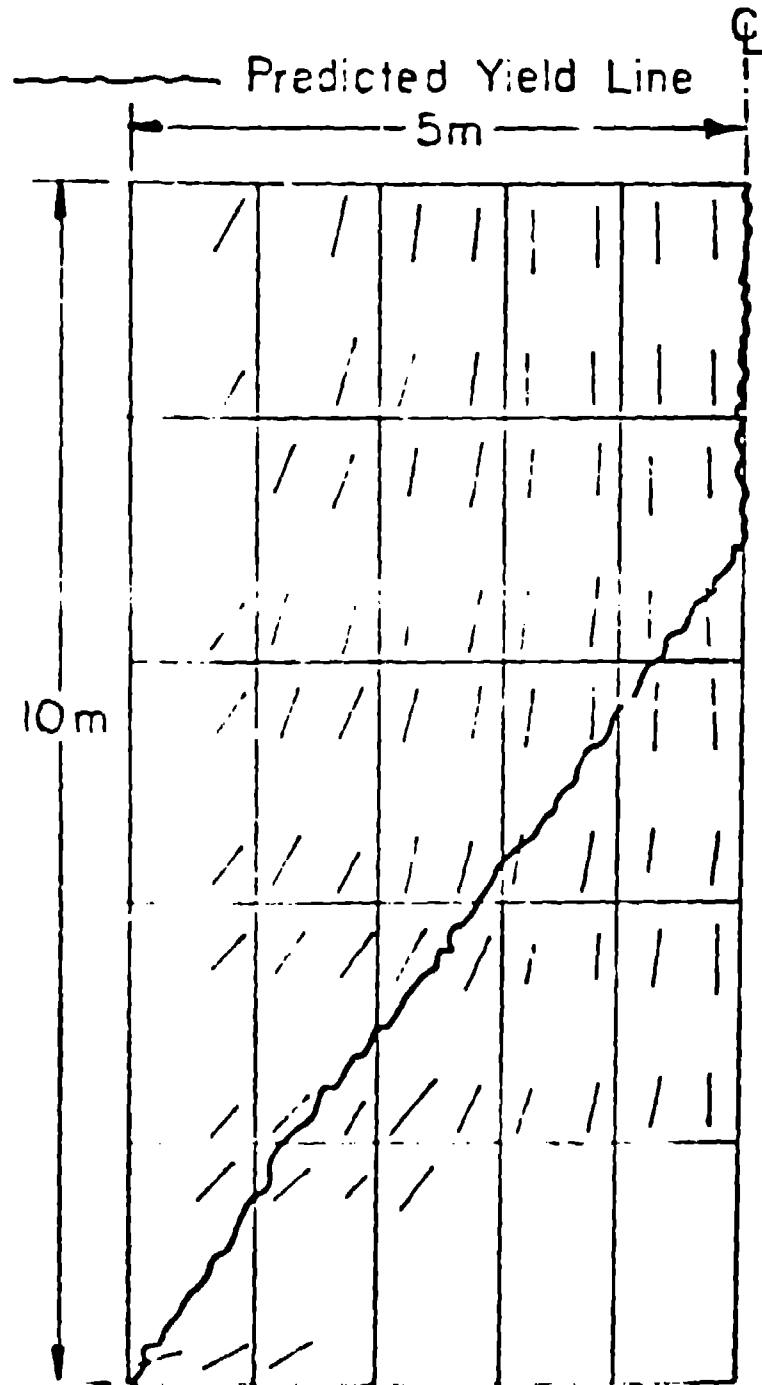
Crack pattern in the reinforced concrete plate.
